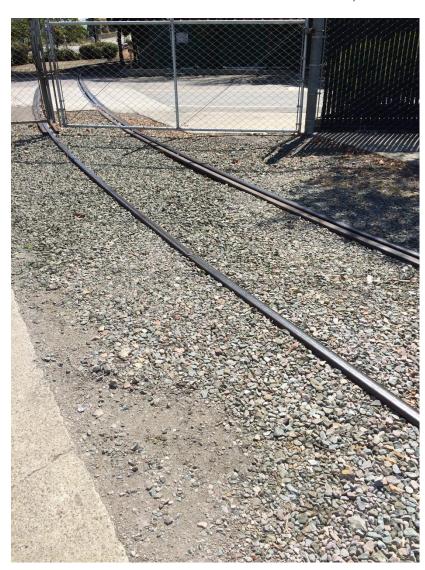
Gravel cover adjacent to gate at northeastern corner of yard.
